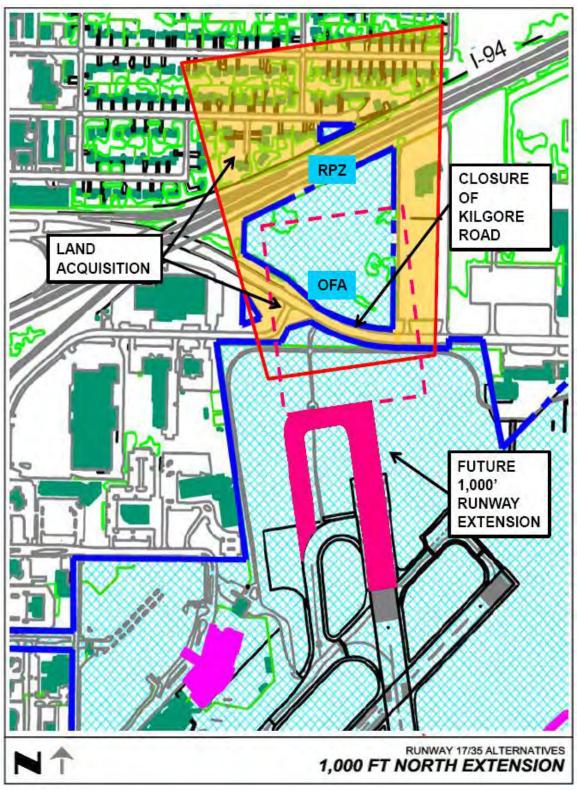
Alternative 5 – 1,000 Feet Extension to North
